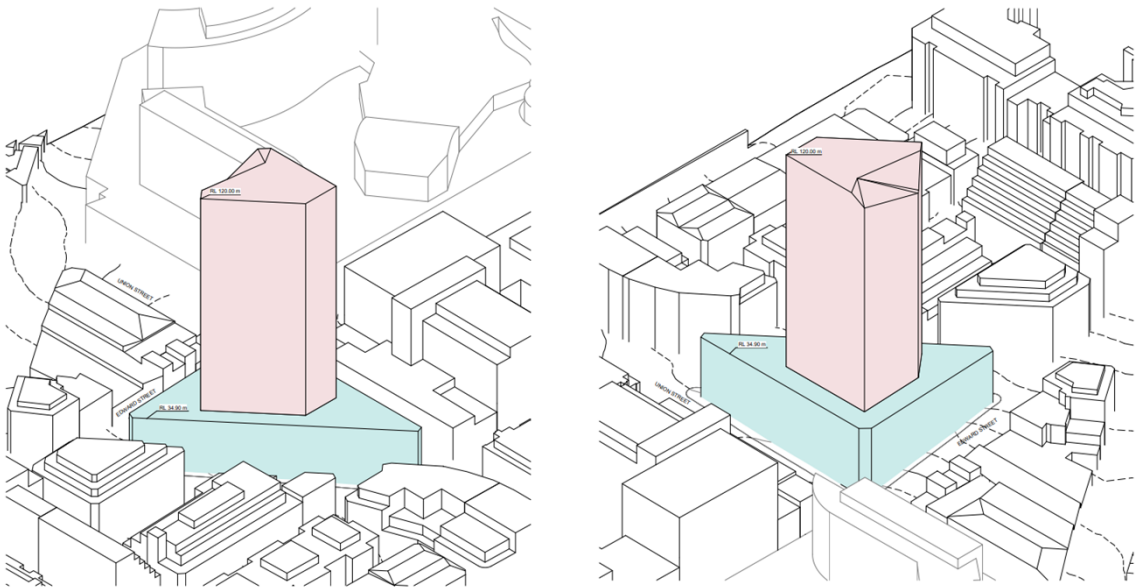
Building envelope from the southeast (left) and northwest (right)
